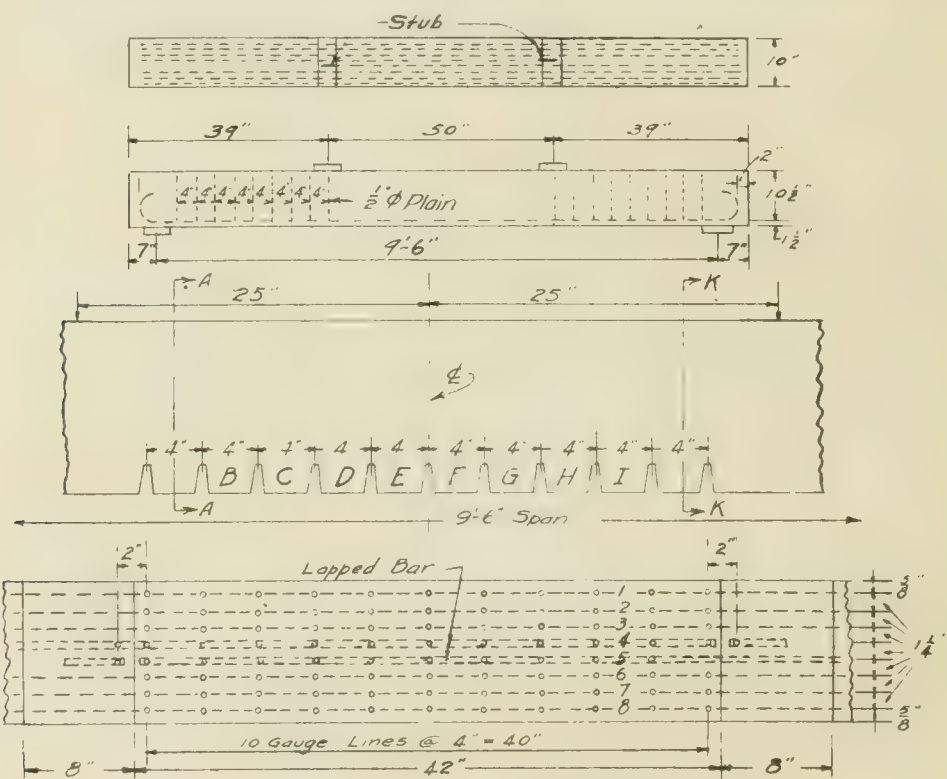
PLANS FOR TESTS OF BEAMS WITH LAPPED BARS.
